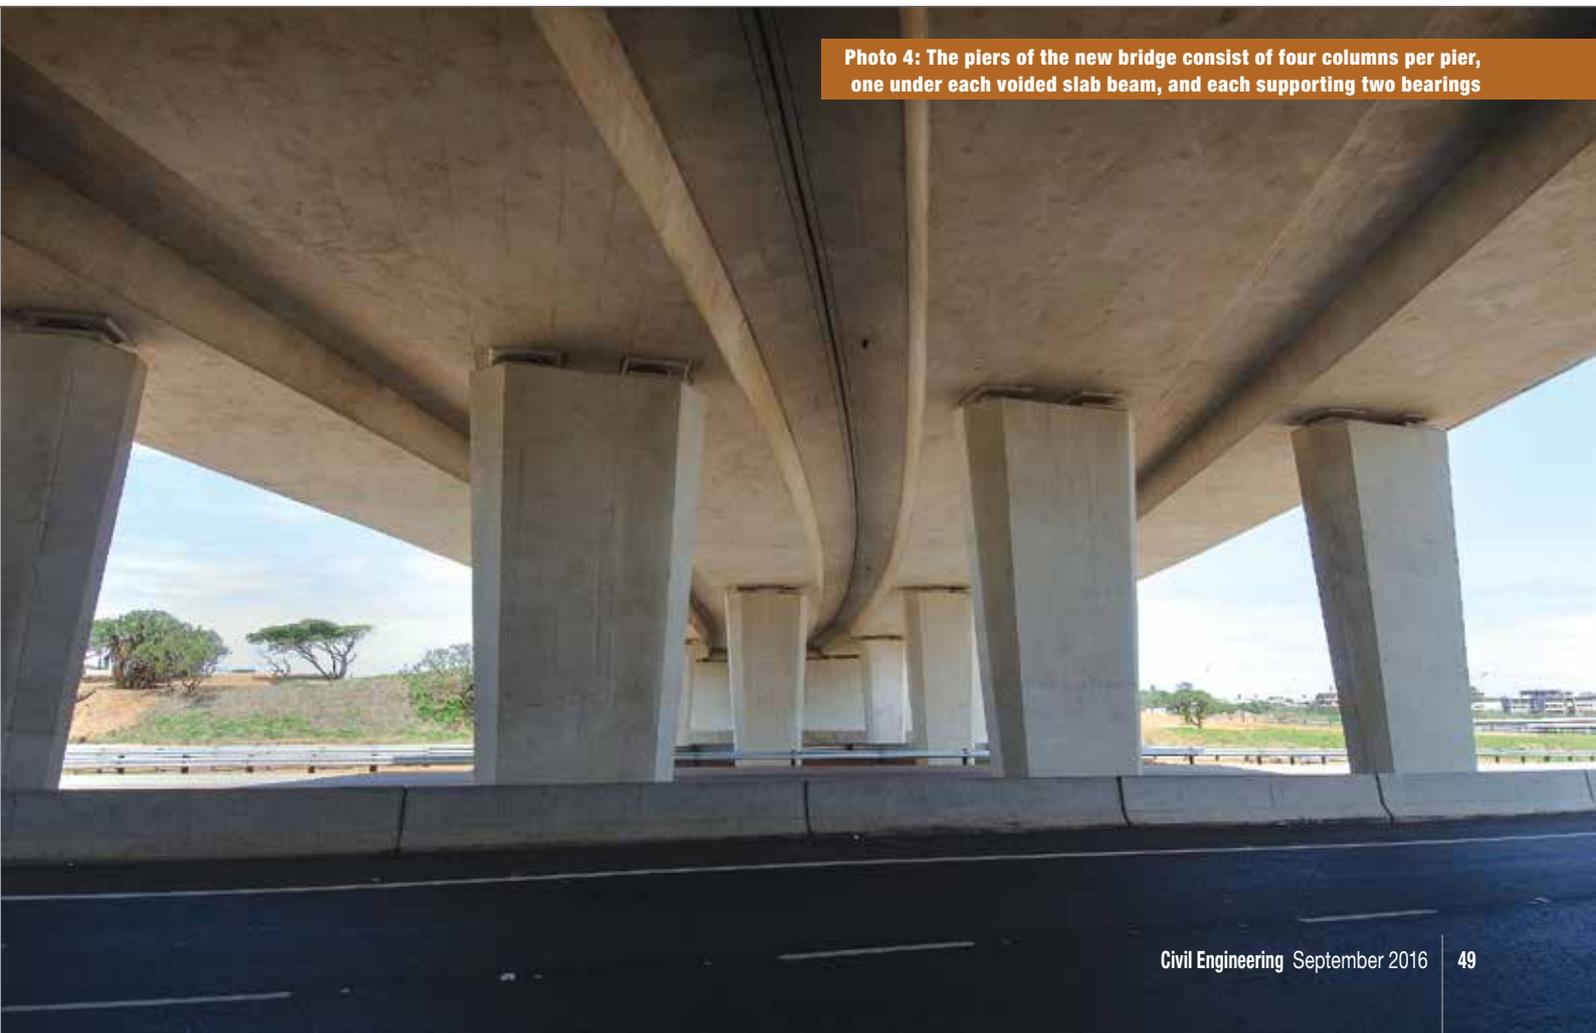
The piers of the new bridge consist of four columns per pier, one under each voided slab beam, and each supporting two bearings
